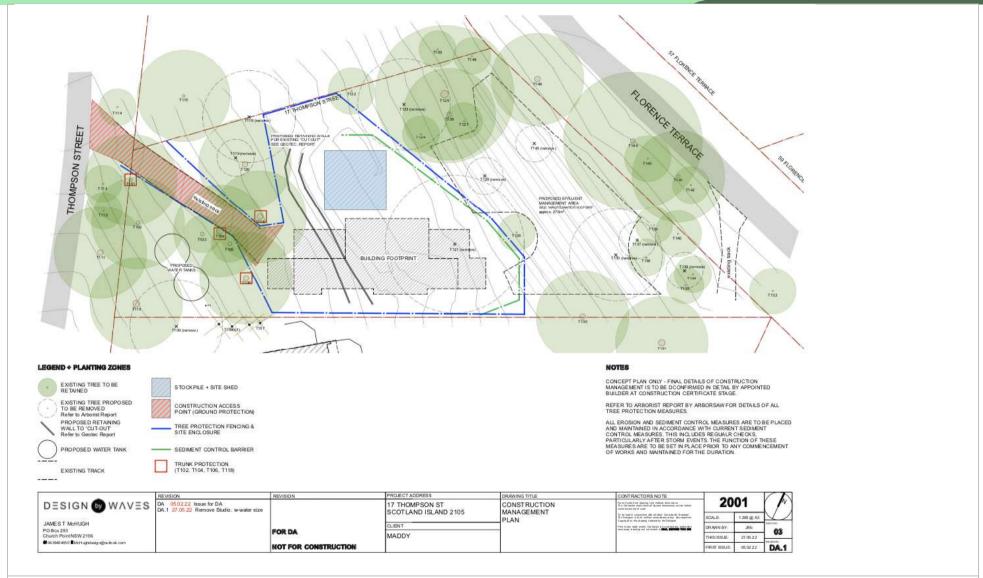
Construction Management Plan and Tree Protection Plan. Source Design by Waves. 03.05.22 Rev. A.1.
